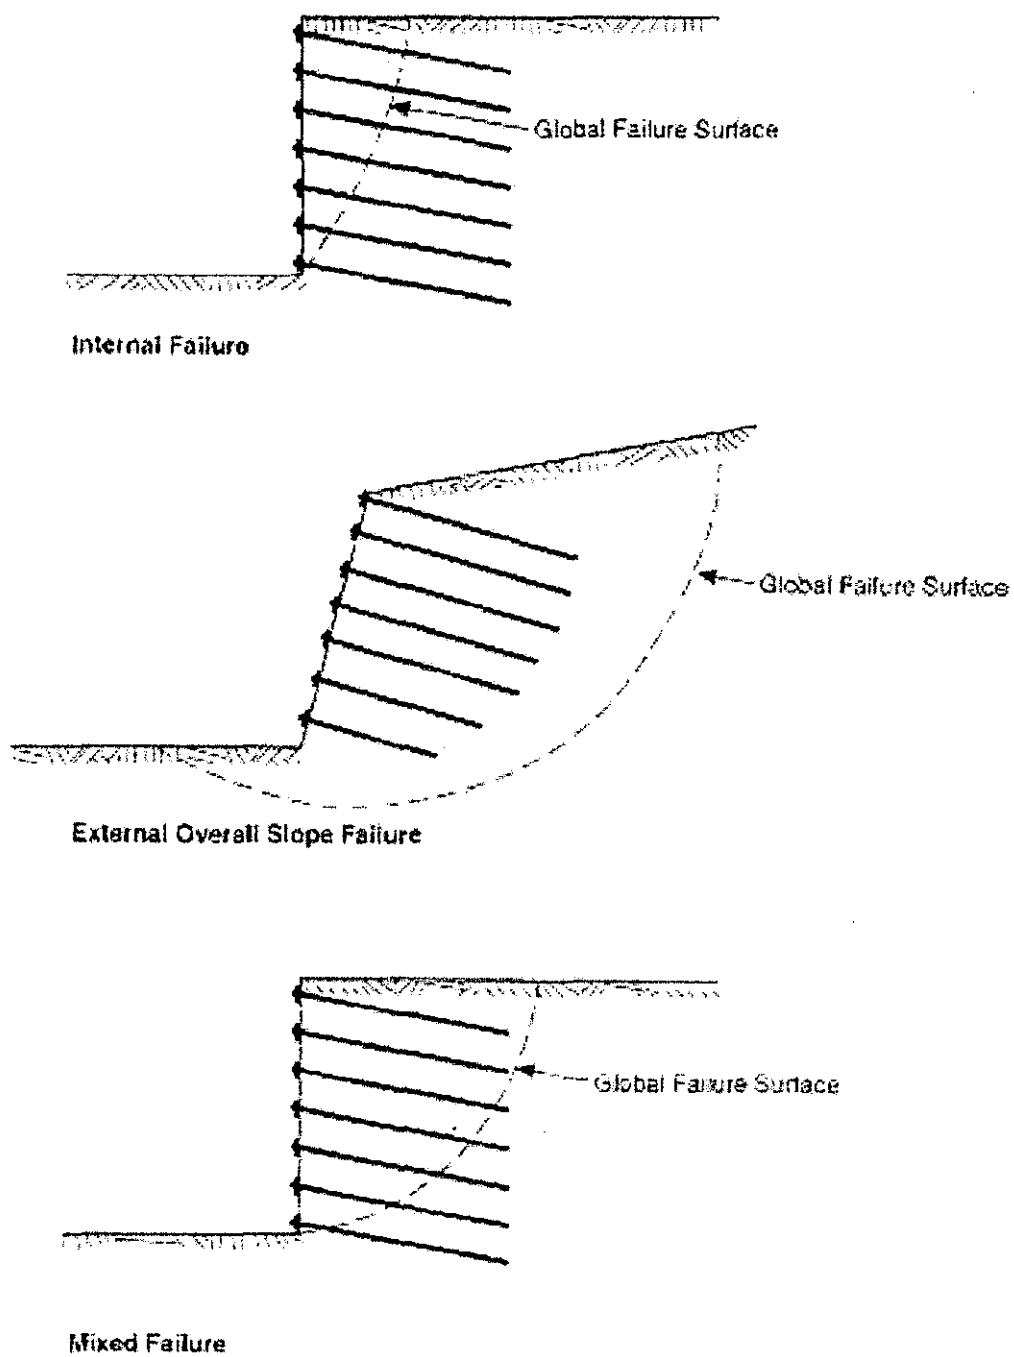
Potential Failure Modes of Soil Nail Wall (from FHWA)
